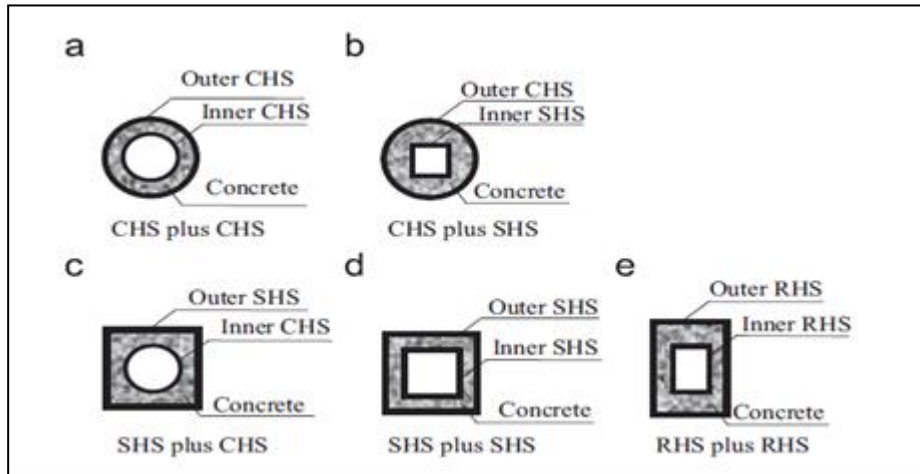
1: Typical profile of concrete-filled double skin tubular column (Lu, Han, et al. 2010)
